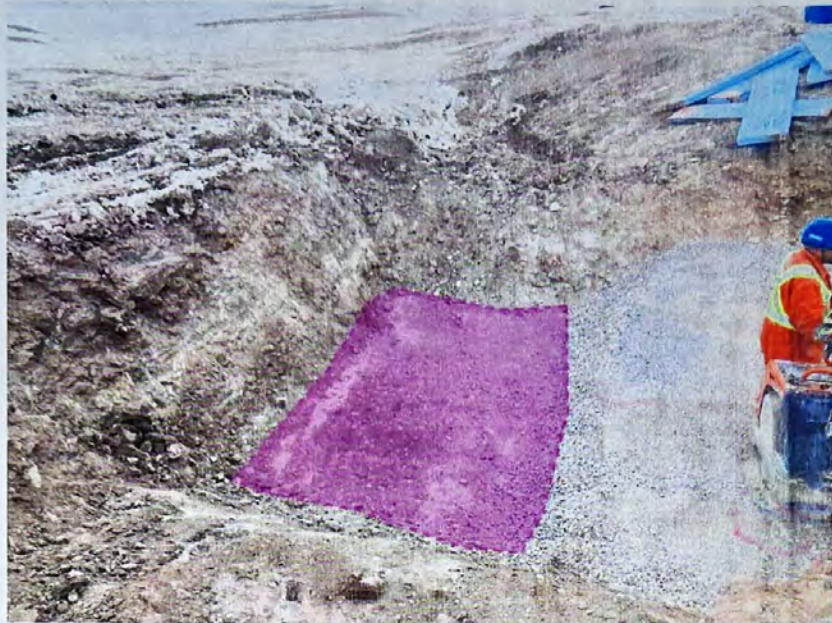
Approximate Foundation Acceptance Area - Section 3, outlined in purple. Photo taken May 6, 2024, looking North.
